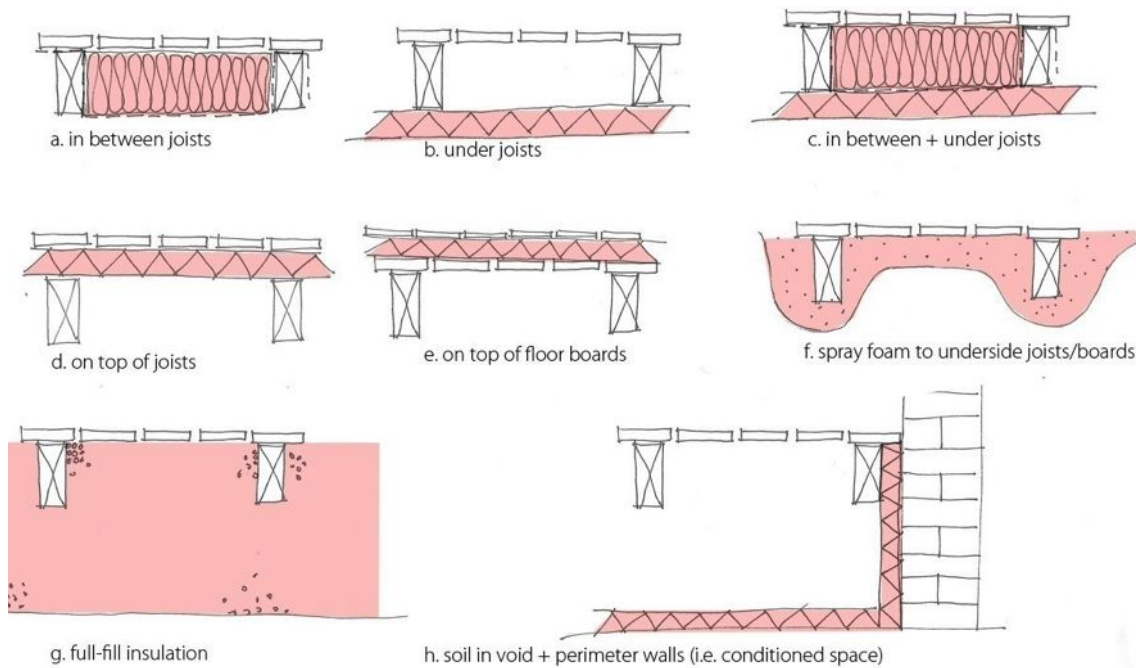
Typical floor insulation methods identified, including typical floor insulation installed in between joists (a.), under joists (b.) or a combination of insulation in between and under the joists (c.), on top of joists (d.) or on top of the floor boards (e.). Other methods include insulation sprayed to the underside of the floor boards and/or joists (f.), full-filling the floor void with insulation (g.) and installing insulation on the ground in the void and/or on the foundation perimeter walls (h.).
